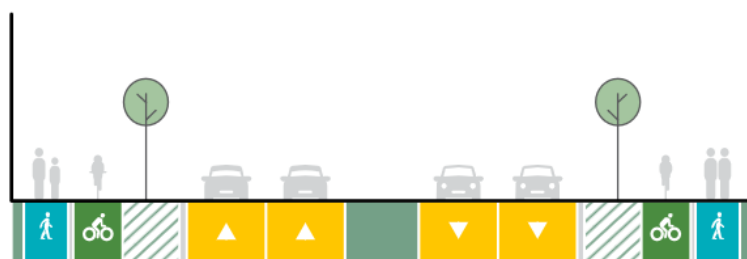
CFAF Outcome S4: Brigham Creek Road to Hobsonville Point Road Indicative 30m cross section
